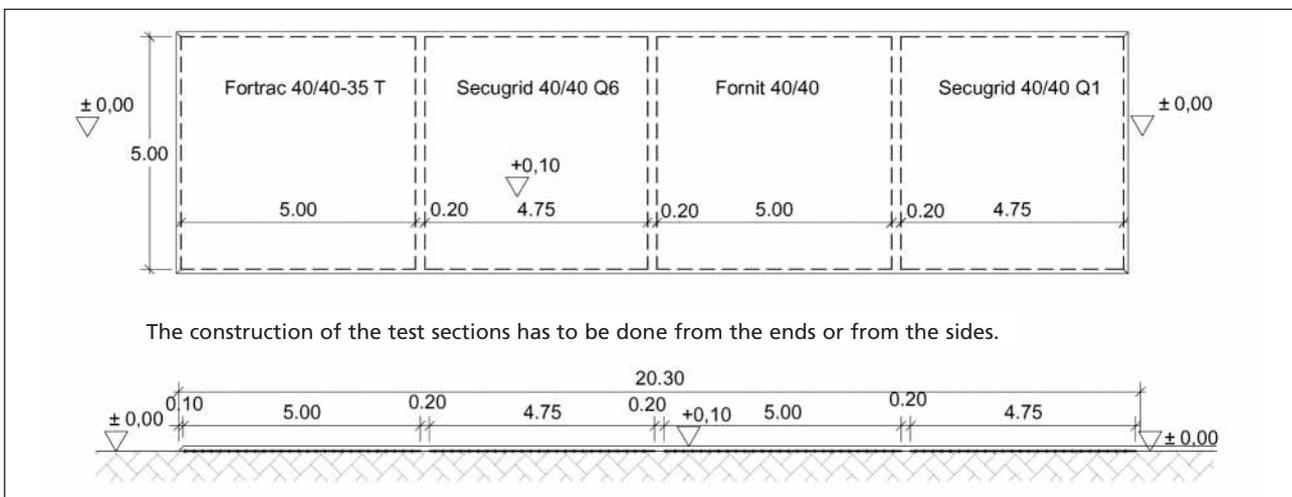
Plan and longitudinal section of the trial earthworks for the "Reinforced sub-base" field test.
